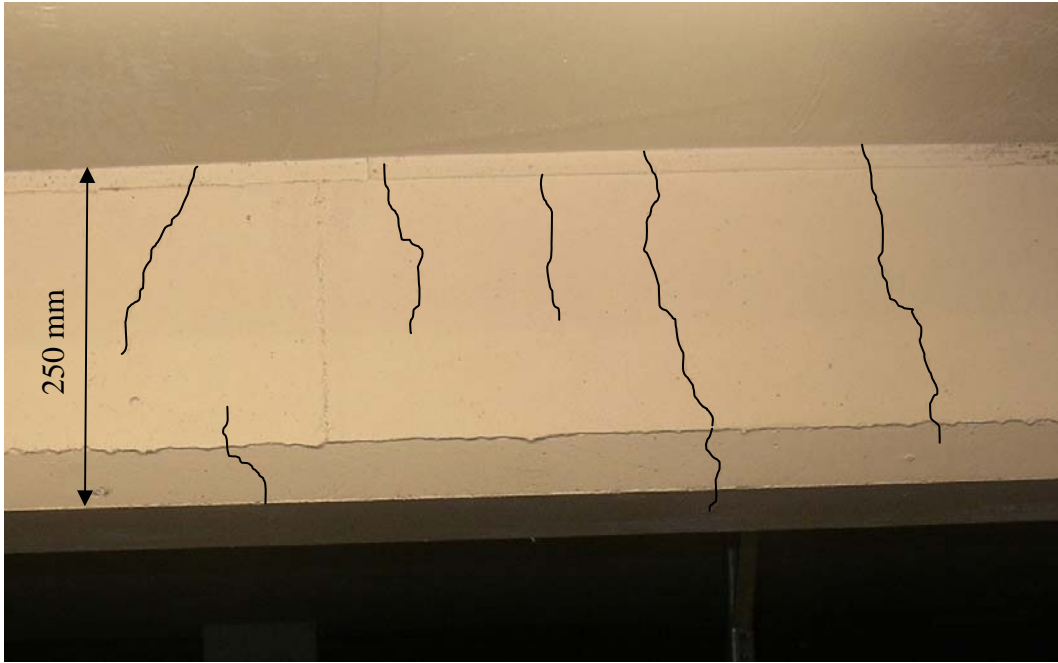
Vertical cracks on the supporting beam. Note that the cracks are intensified by drawings on the photo.
